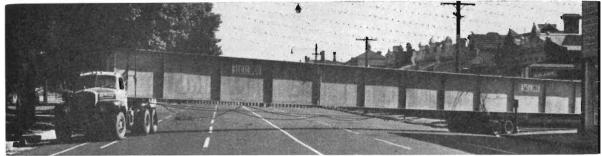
Bridge girder 115 feet long being transported to the Punt Road Over-pass via Hoddle Main Road.
